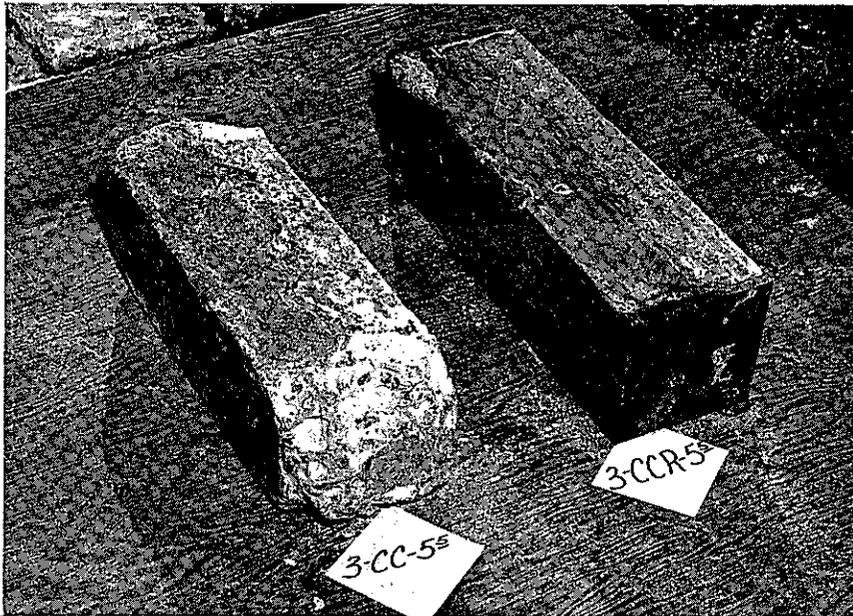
5-1/2-sack shrinkage compensated cement beams after 20 months sulfate exposure. Beam on right is externally restrained.
